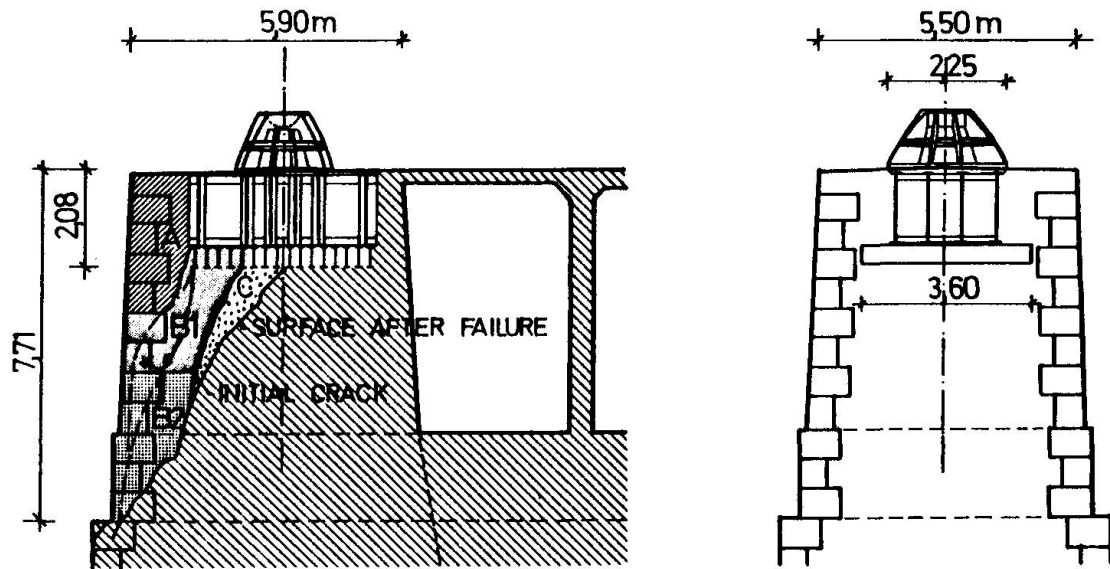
PIER XVIIa CRACK FORMATION AT FAILURE
